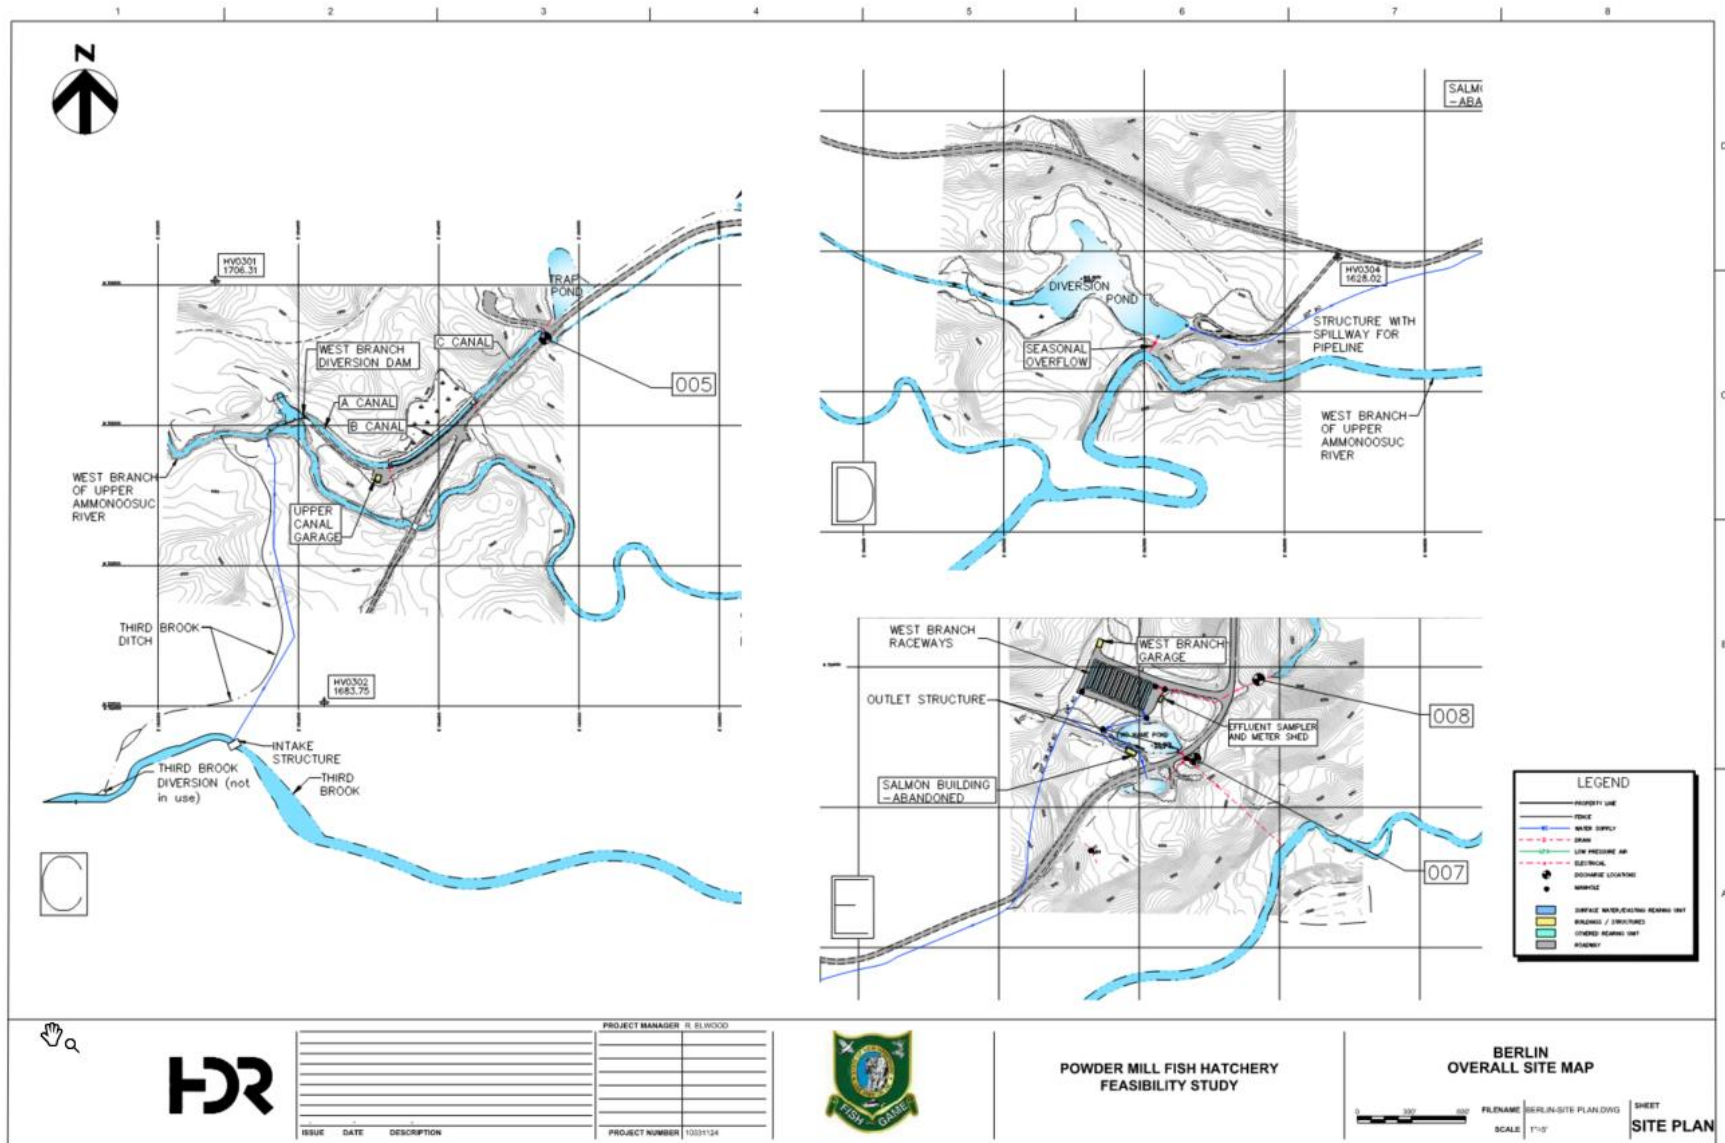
Zoomed Berlin Site Plan C-D-E
